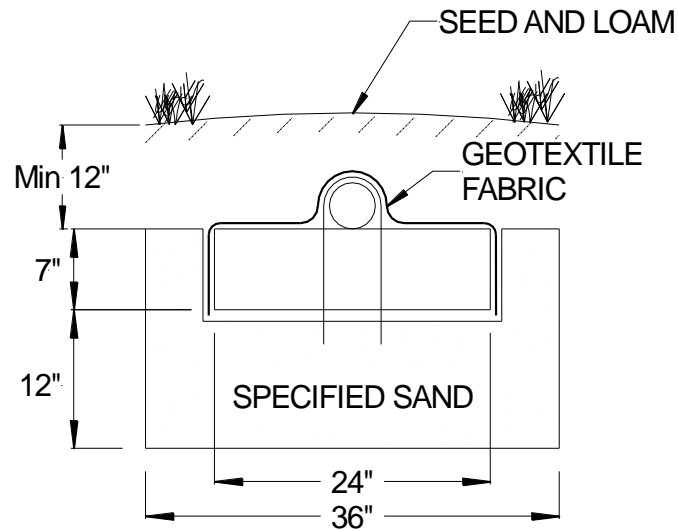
TYPICAL A42 GSF CROSS SECTION
